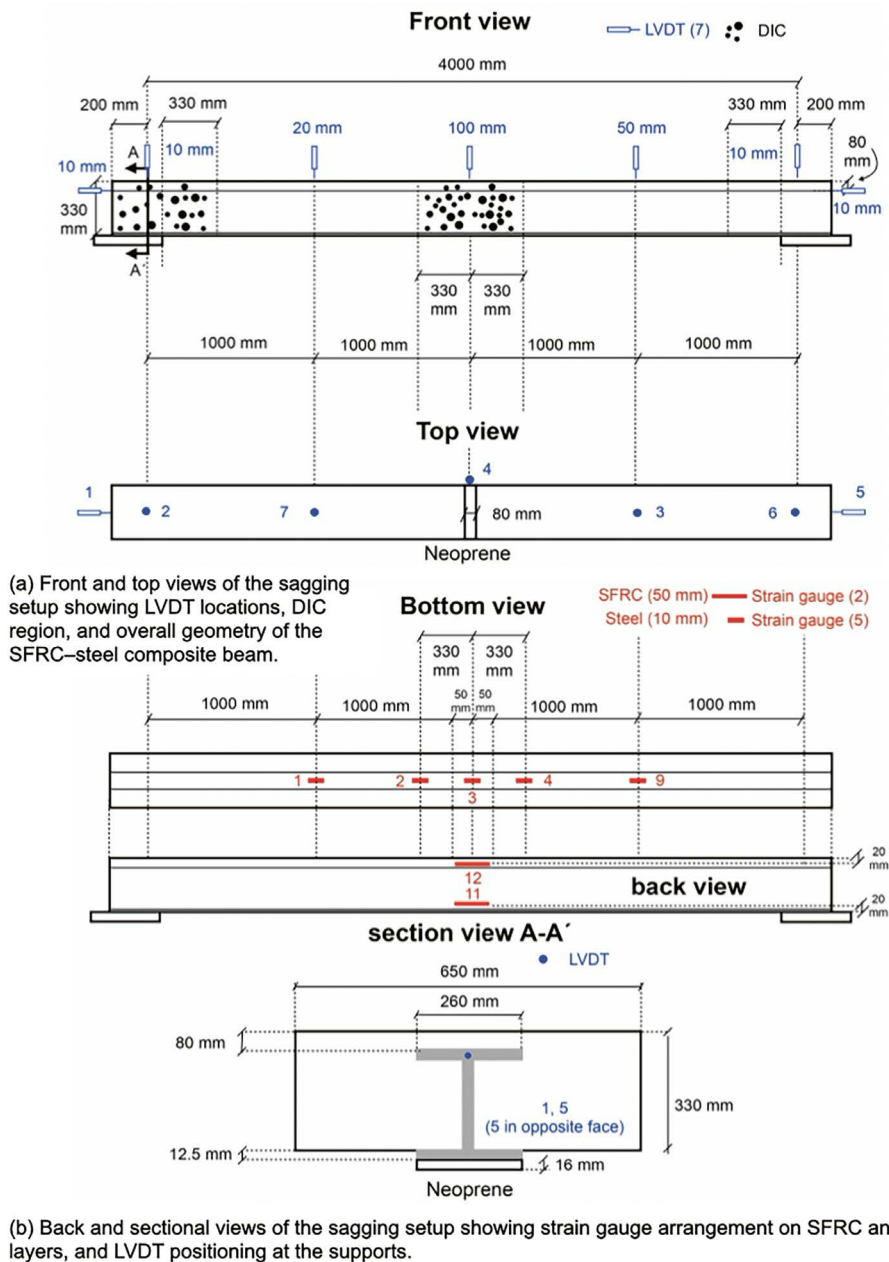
Instrumentation and geometry of the sagging configuration used for three-point bending tests on SFRC-steel composite beams: (a) Front and top views with LVDTs and DIC region, and (b) back and sectional views detailing strain gauge layout and support conditions.
